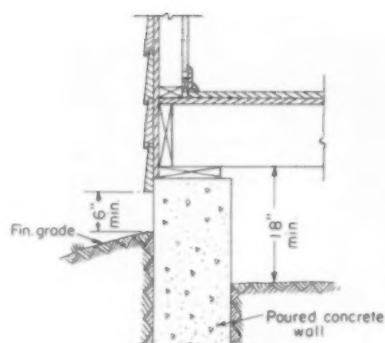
Easily inspected poured concrete foundation walls or piers⁽¹²⁾
